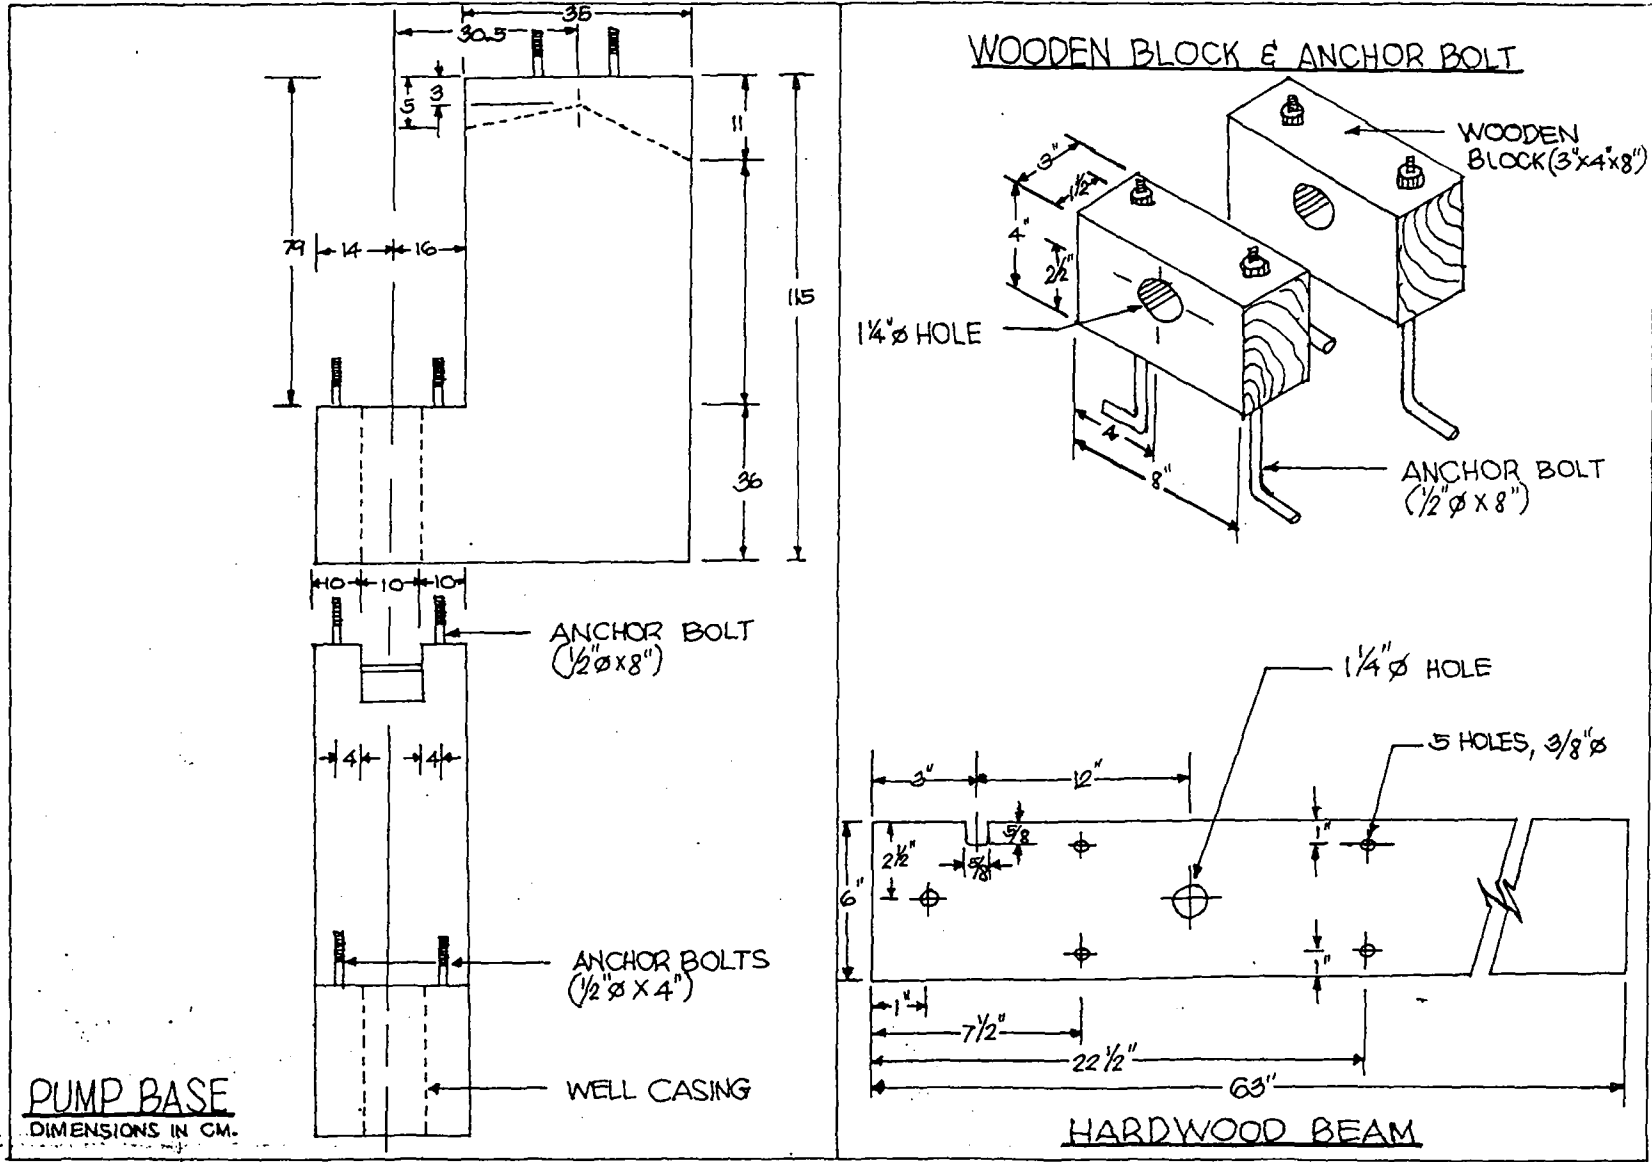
DETAILS OF COLUMN, WOODEN BLOCK & BEAM
